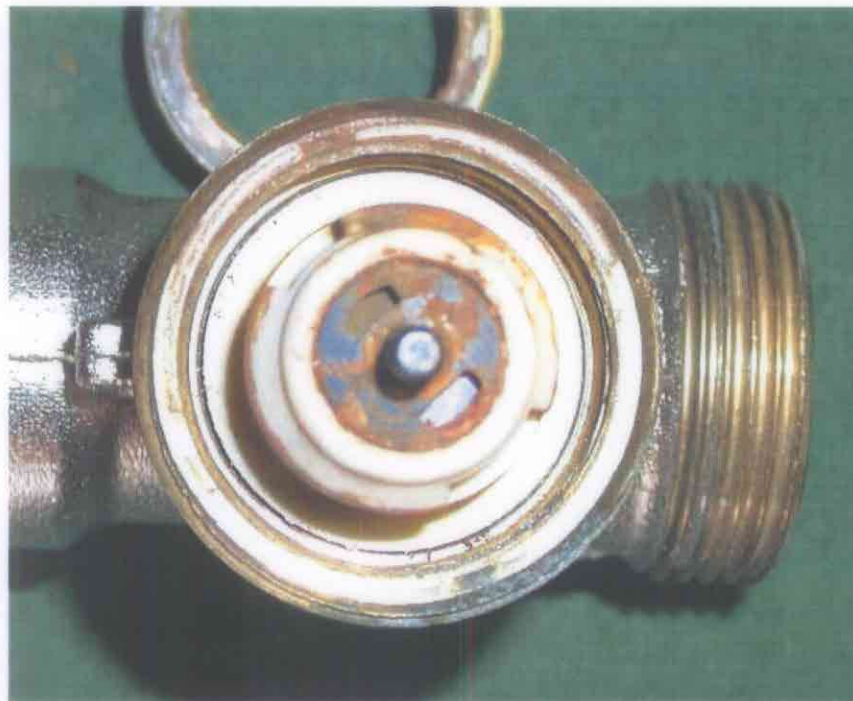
Precipitated corrosion products and particles at mechanical parts in motor valve.
